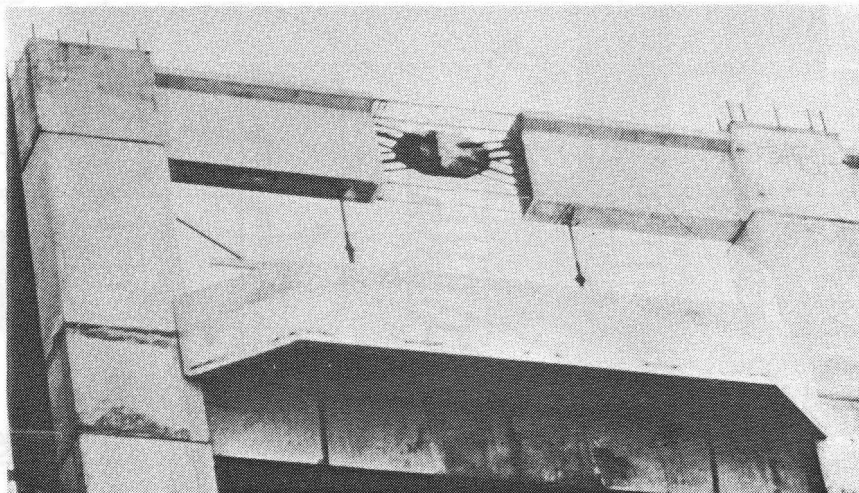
Bolted Midspan Connections Between Precast Concrete Diagonally Reinforced Beams with Relocated Plastic Hinges.
